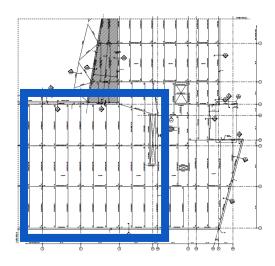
LEVEL 4 FRAMING PLAN SHOWING TYPICAL BAY (\$104.D)
